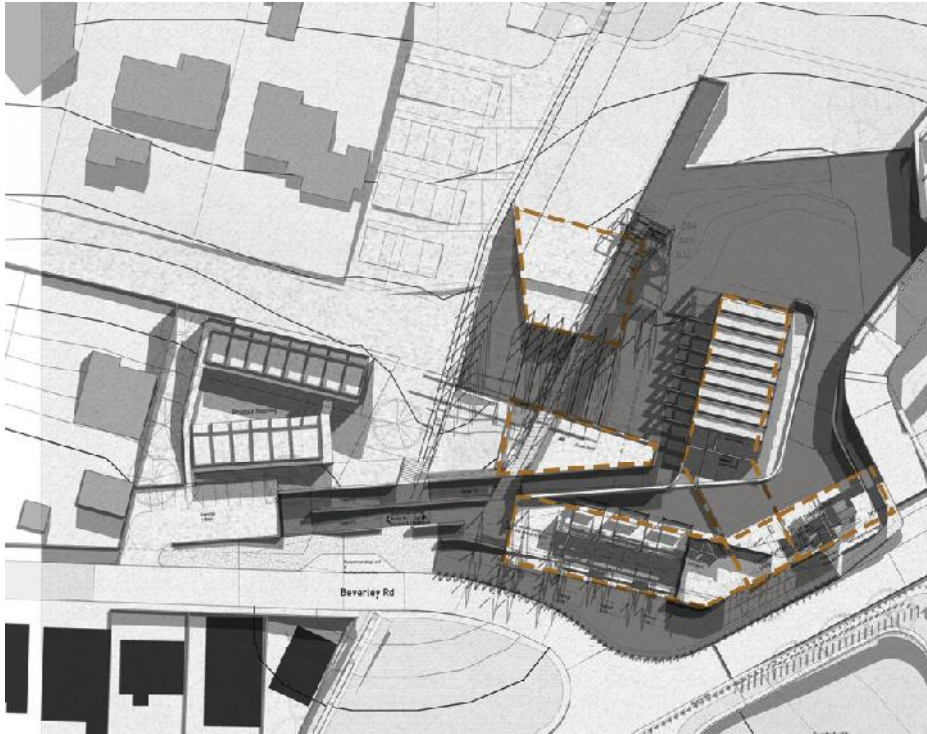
Response to existing fabric (height of tower, mass of IEC office building, existing parking structure)
